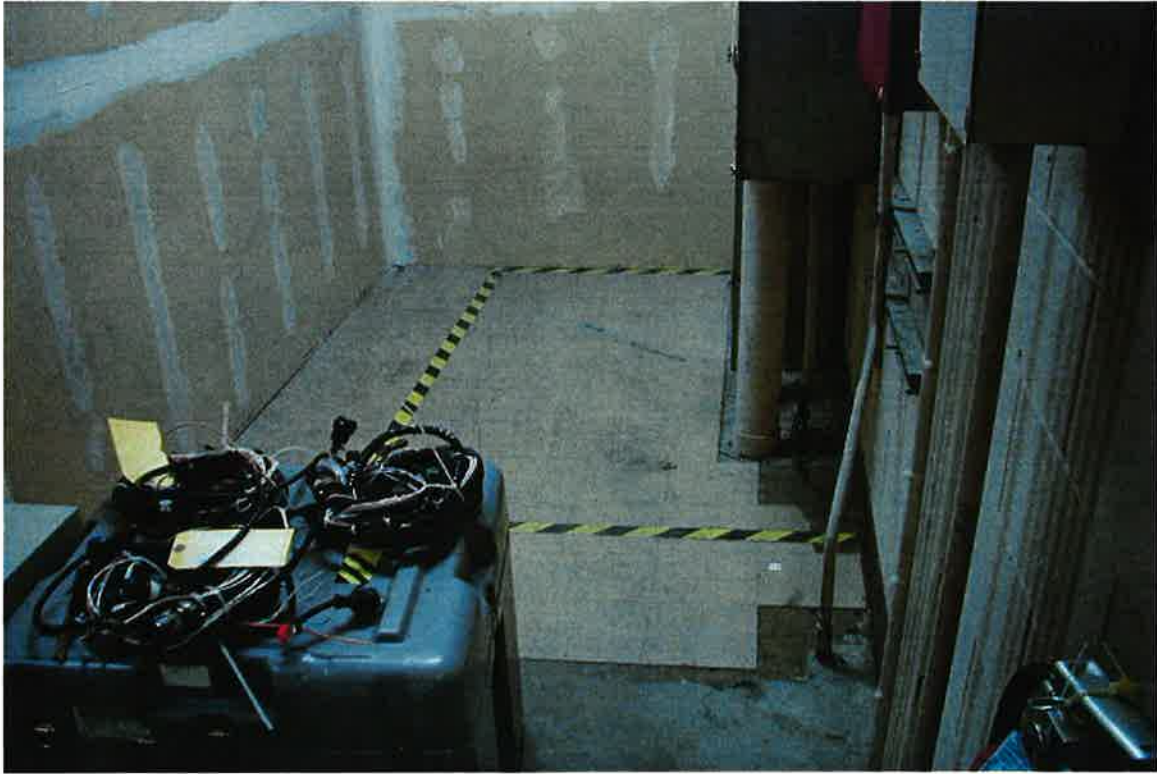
Hangar 6, 9- inch brown vinyl floor tile and gypsum wallboard.
